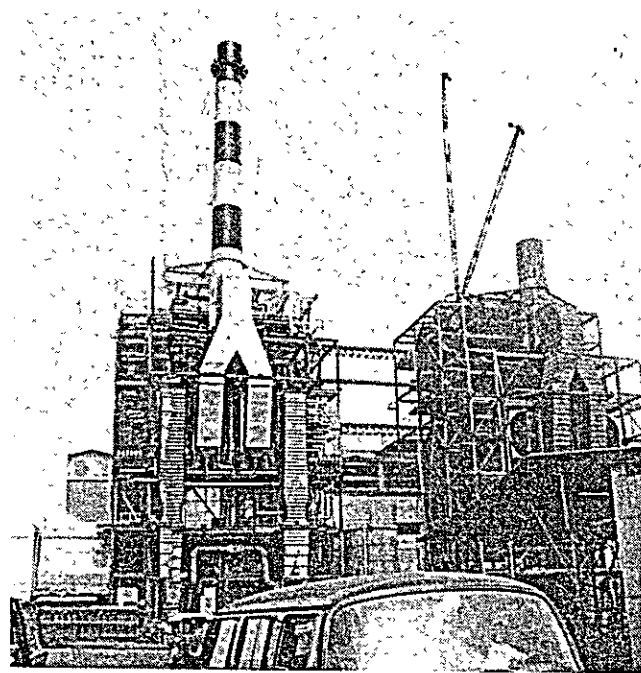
South Bangkok Thermal Power Plant Under Construction
